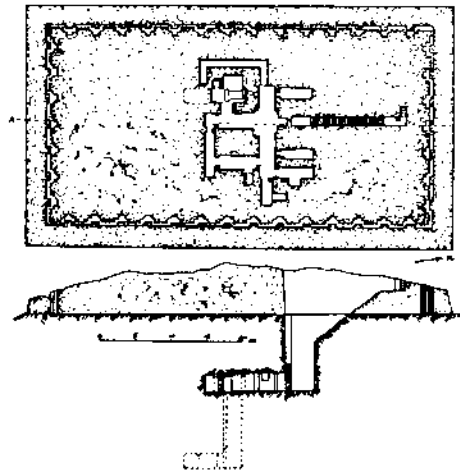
Plan and section of mastaba T at Giza (stairway + shaft type, IIIrd dynasty).
